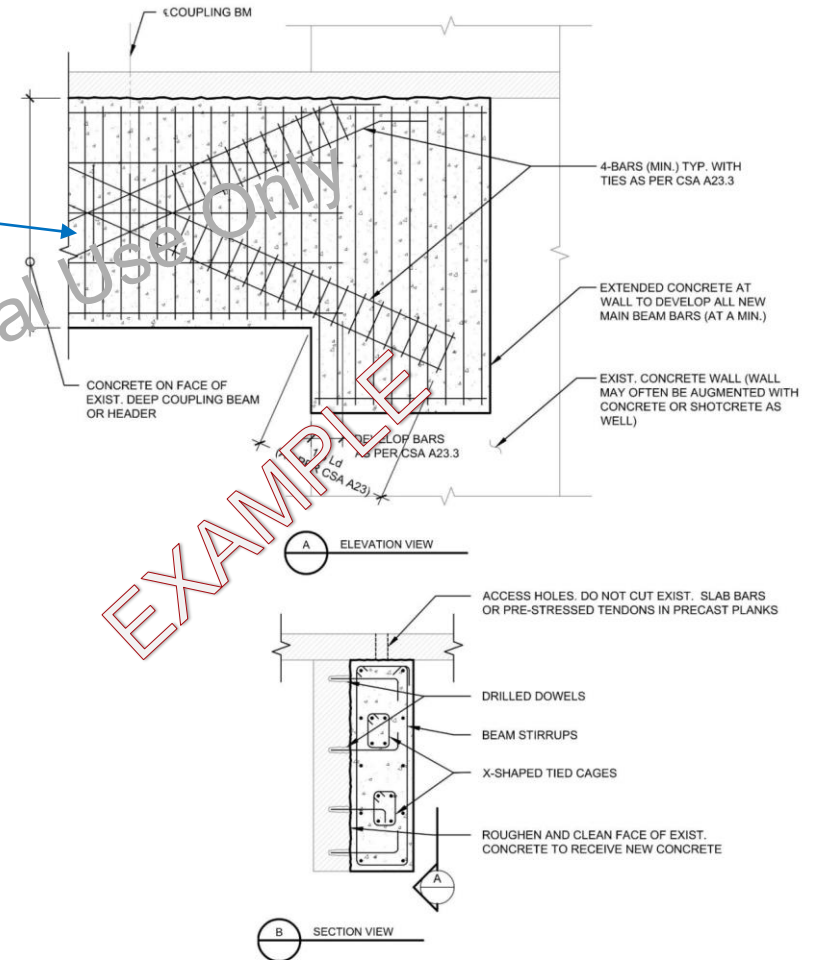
Enlargement of the existing deep concrete coupling beam
